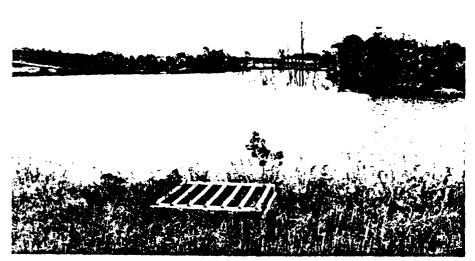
LOOKING UPSTREAM FROM CREST
